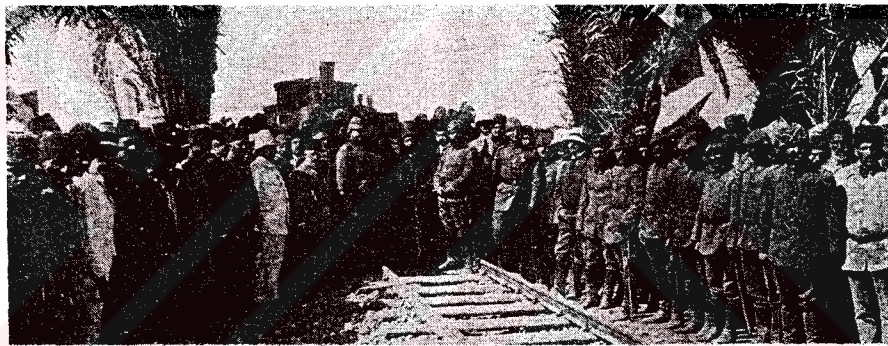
Baghdad, Railroad Construction, 1887.
